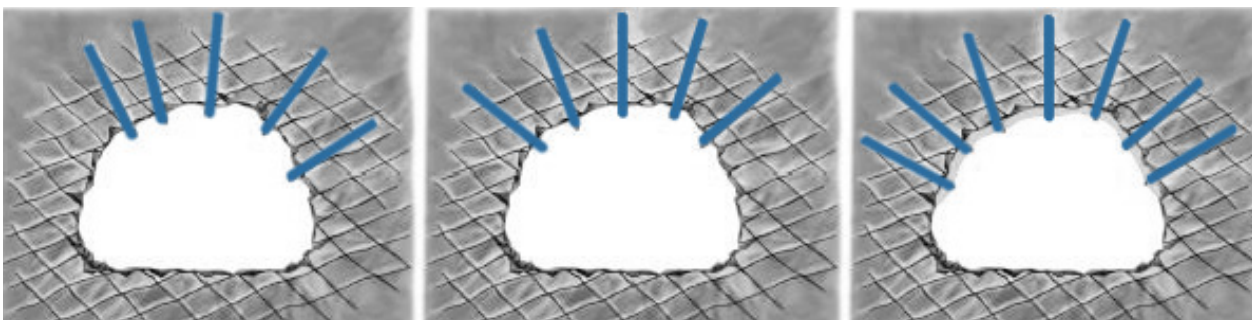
Examples of bolting in front of coarse-blocked rock
